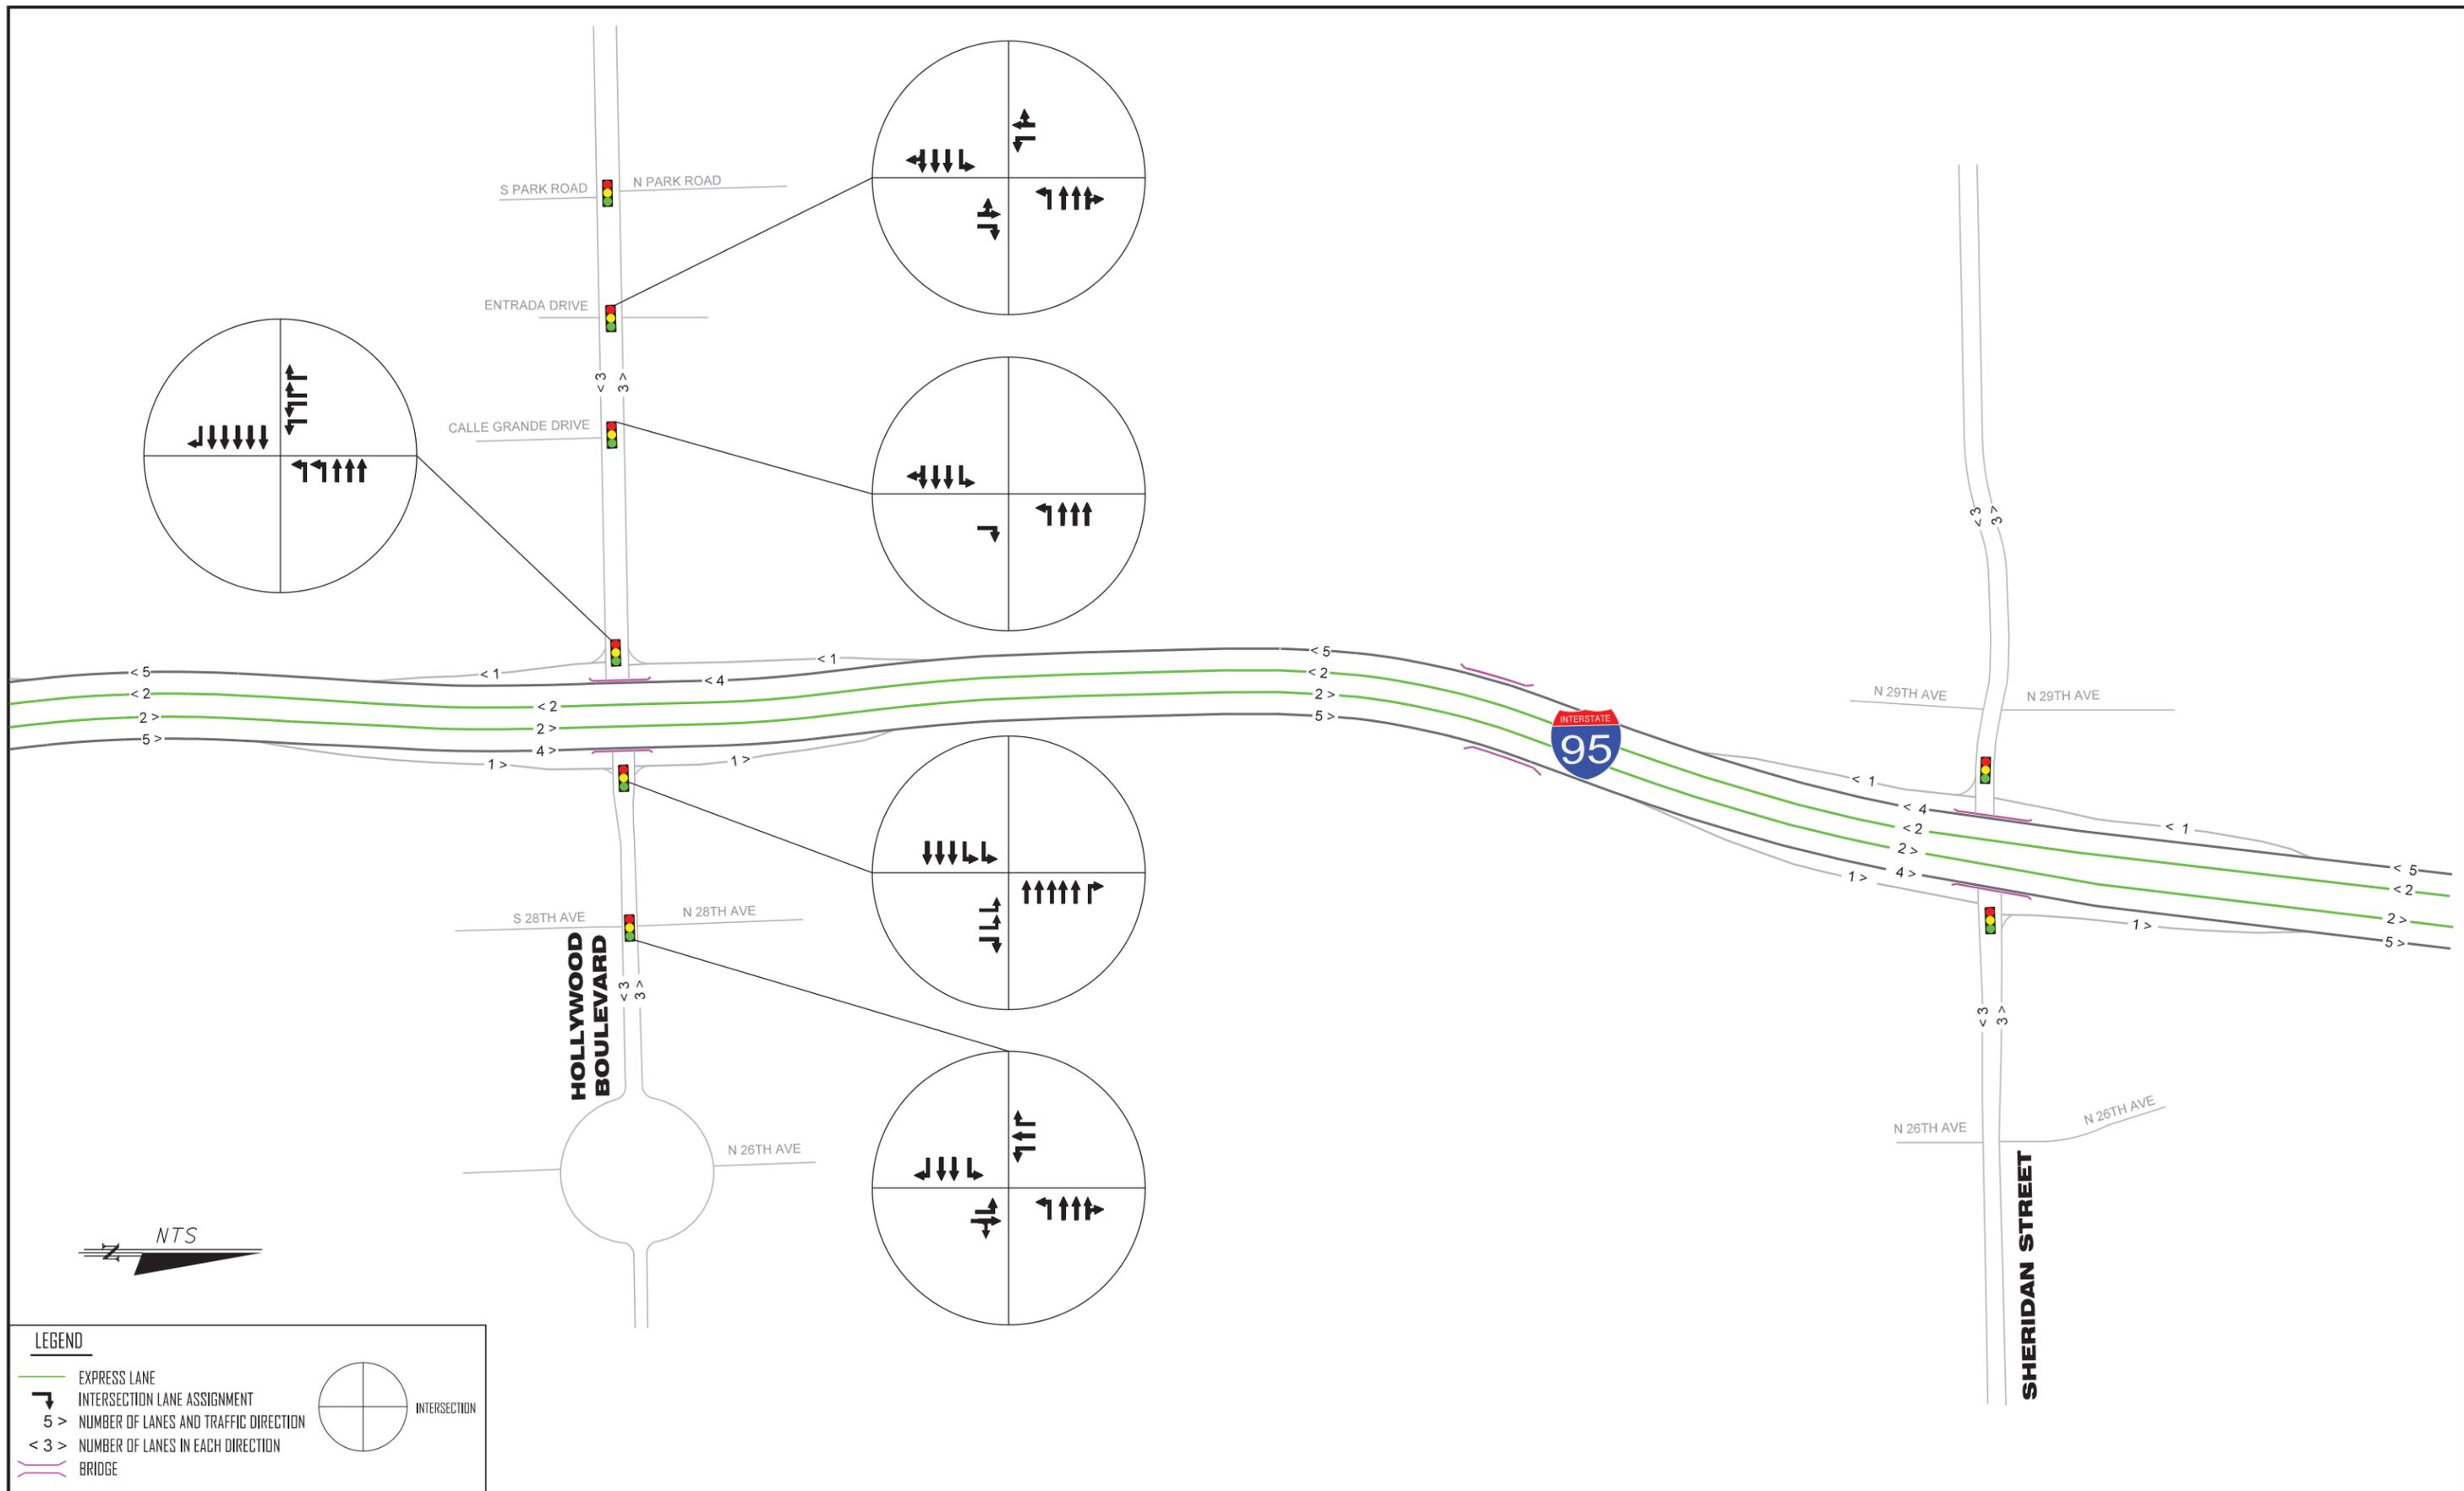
I-95 Existing Roadway Section North of Pembroke Road
